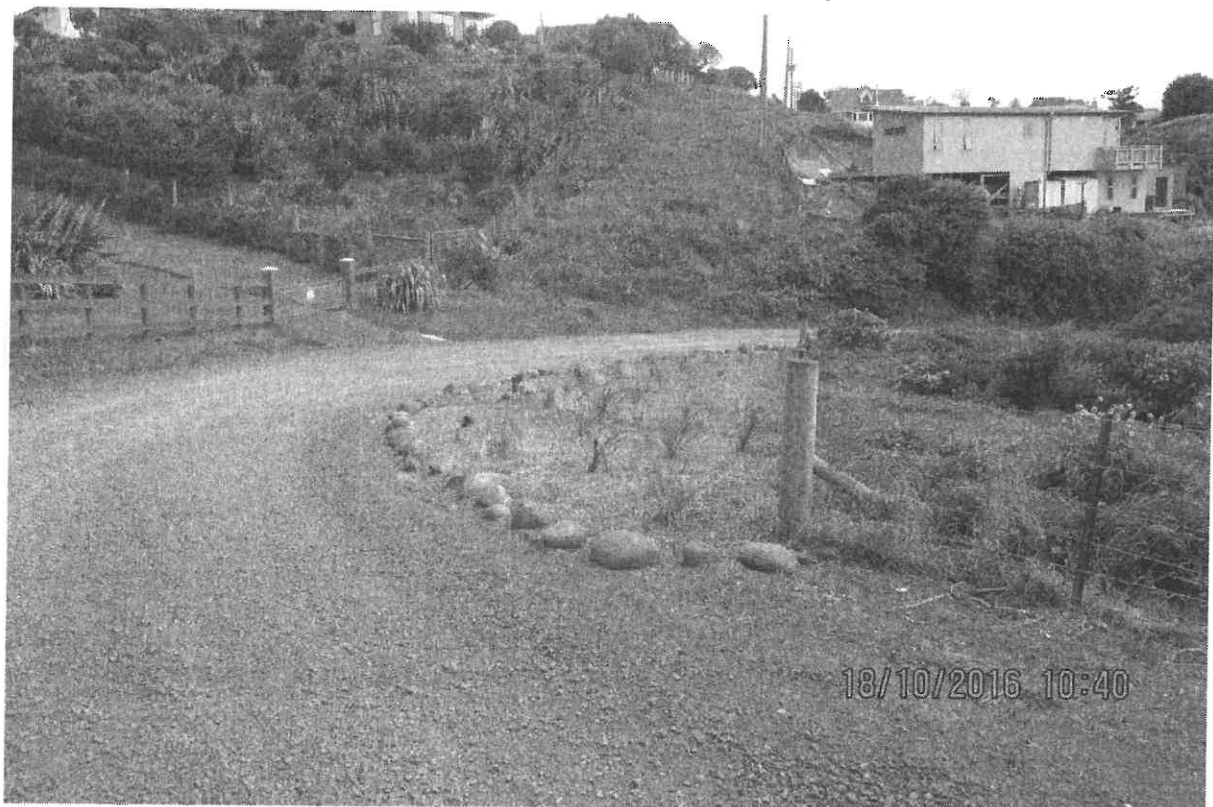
The Isadore Road section, looking straight up the unformed road corridor of Isadore Road, with 2E Cliffs Road on the right.
